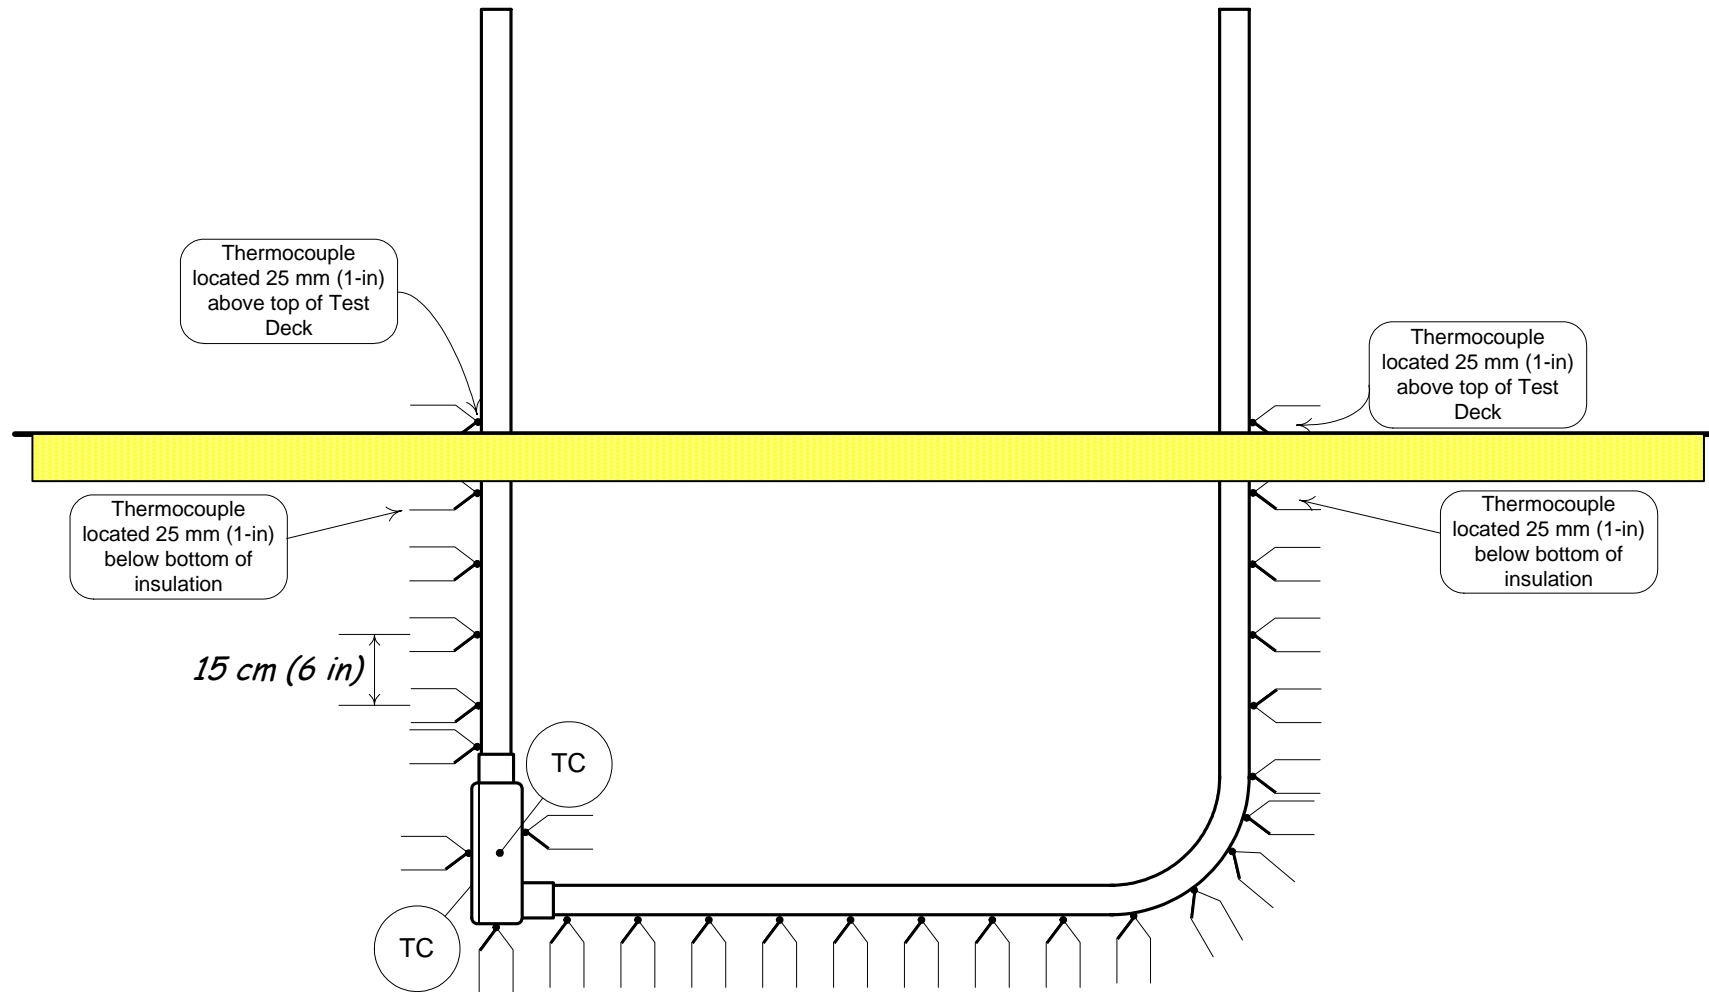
Thermocouple placement on 63-mm (2½-in) conduit test specimens (additional thermocouples to be attached—at 150-mm [6-in] spacing intervals—to a bare #8 copper wire routed through conduit).
